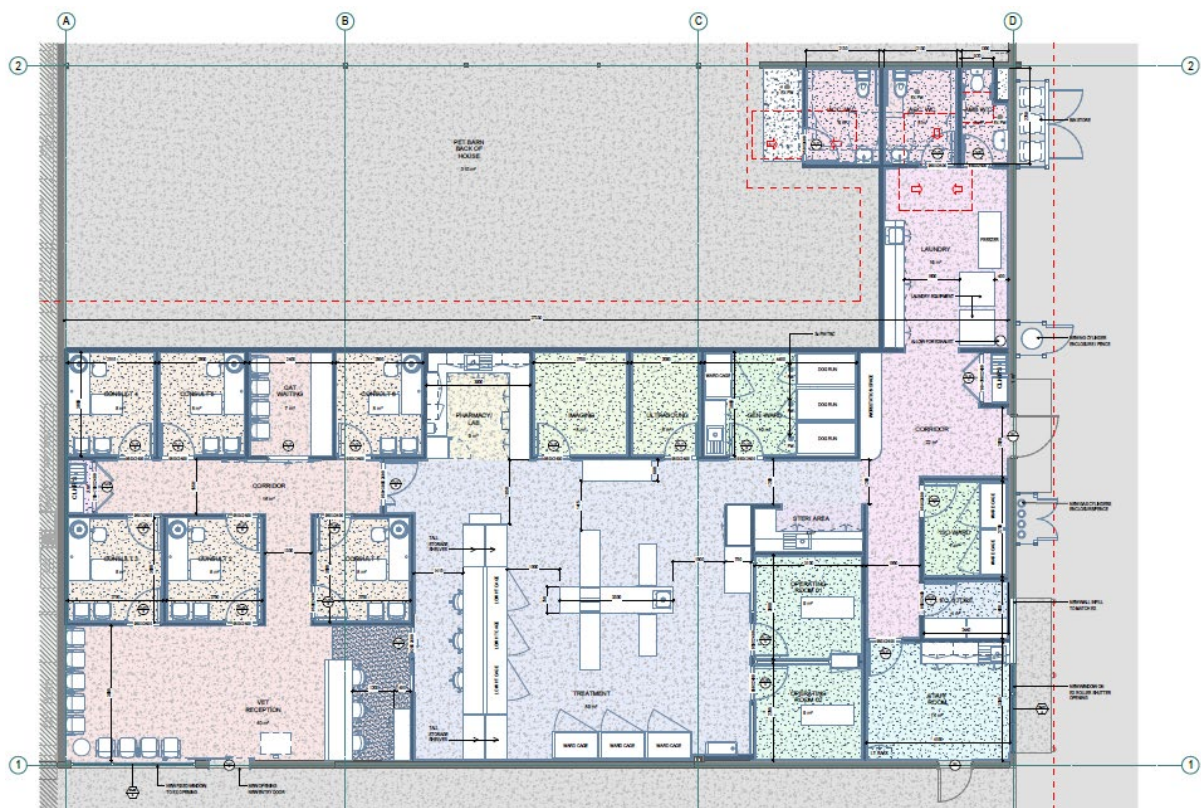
Floor Plan for Vet Clinic (MCA Architects, 2026)
